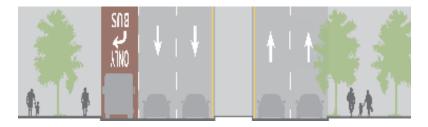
| Alternative 5 Cross-section of Tyco Road from Route 7 to Spring Hill Road
